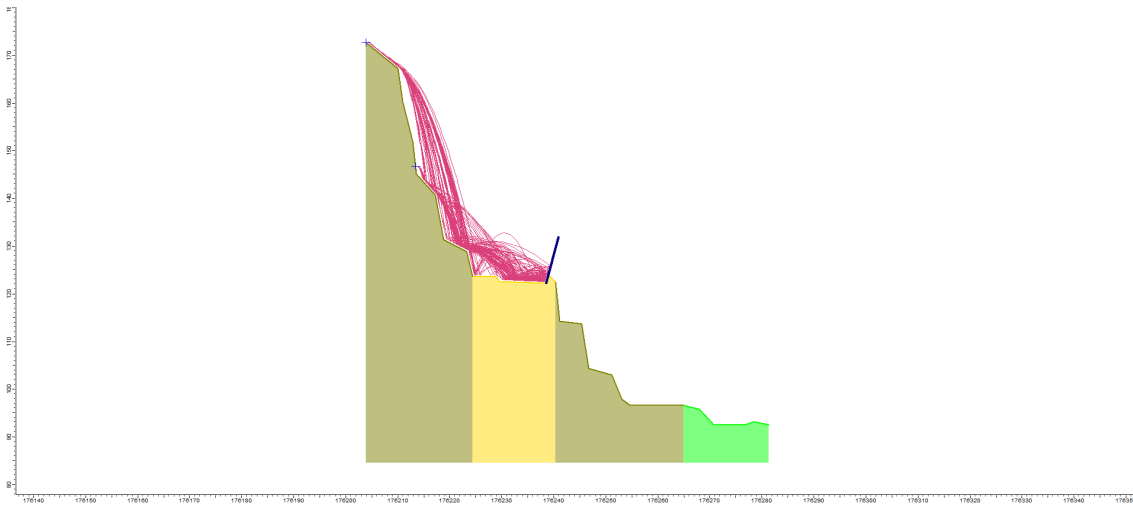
Centre cross-section of the slope showing suggested location of the barrier and how it would control/block rocks
